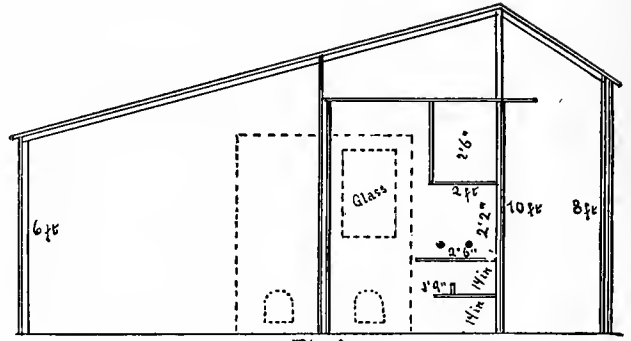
Sectional view, dotted lines showing door to roost room and open shed.
